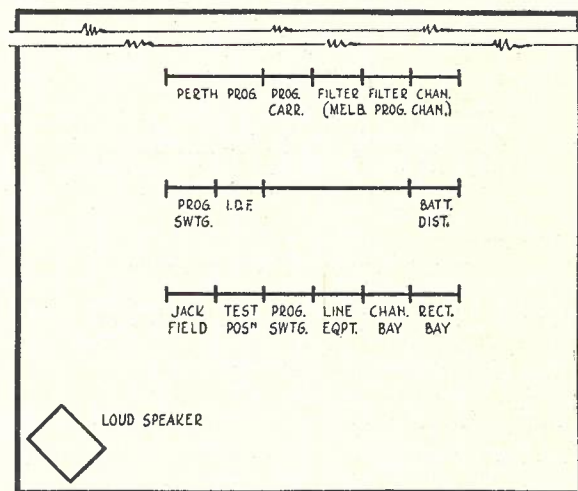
Floor Plan, Programme Room, Adelaide.
